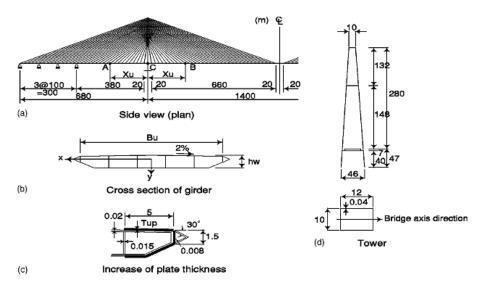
1400 m cable-stayed bridge (Unit: m)
